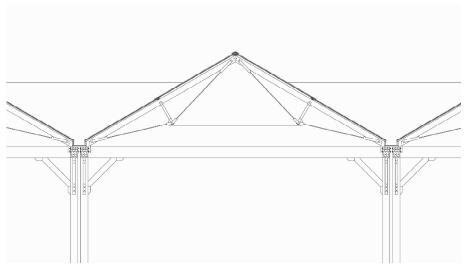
all operations together, new detail Gardenplatform construction 'BB. Roofconstruction step 3.
